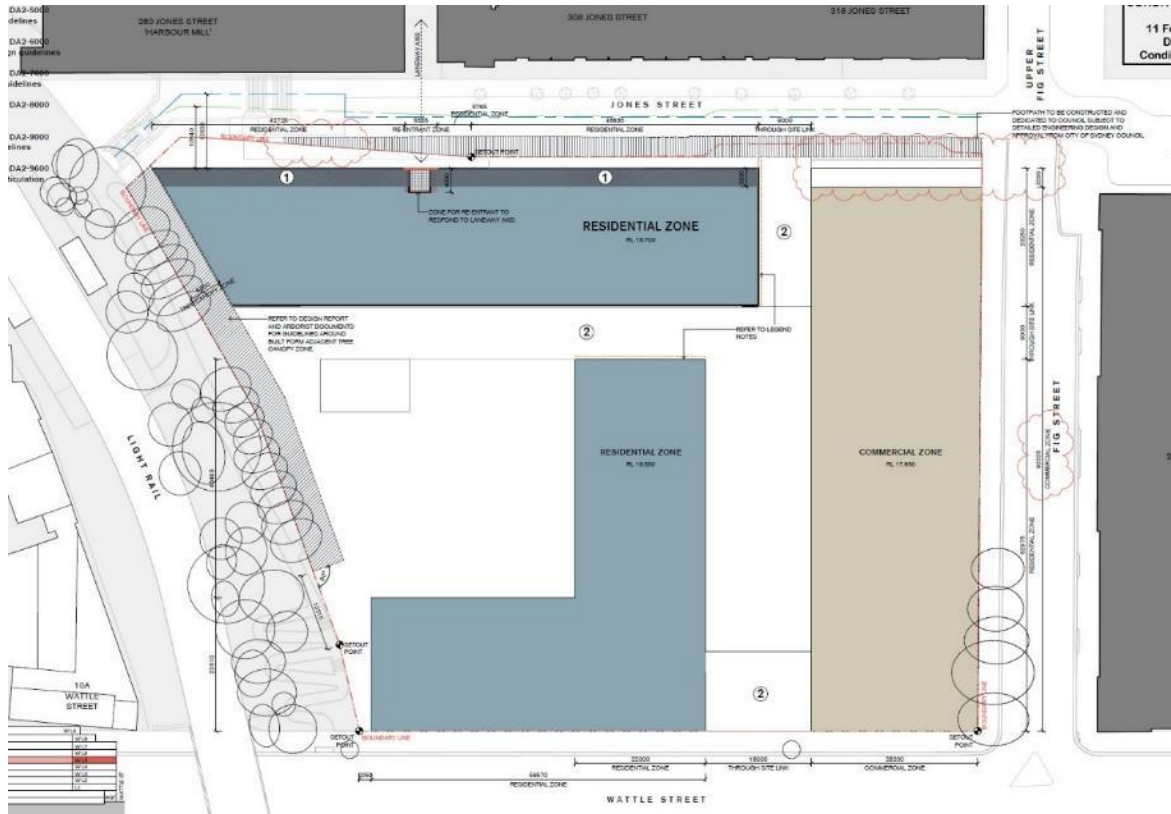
Envelope plans: Approved Level 3/4 and proposed Level 04/05
